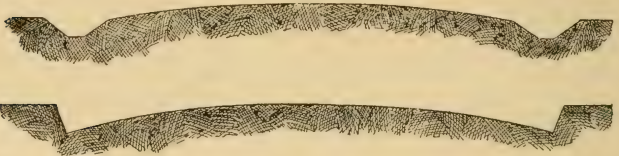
Properly Crowned Earth Road. Cross sections of two good forms for earth roads. The lower section can be made with a road machine, and both sections can be rolled and constructed so that water will run off easily and quickly.
